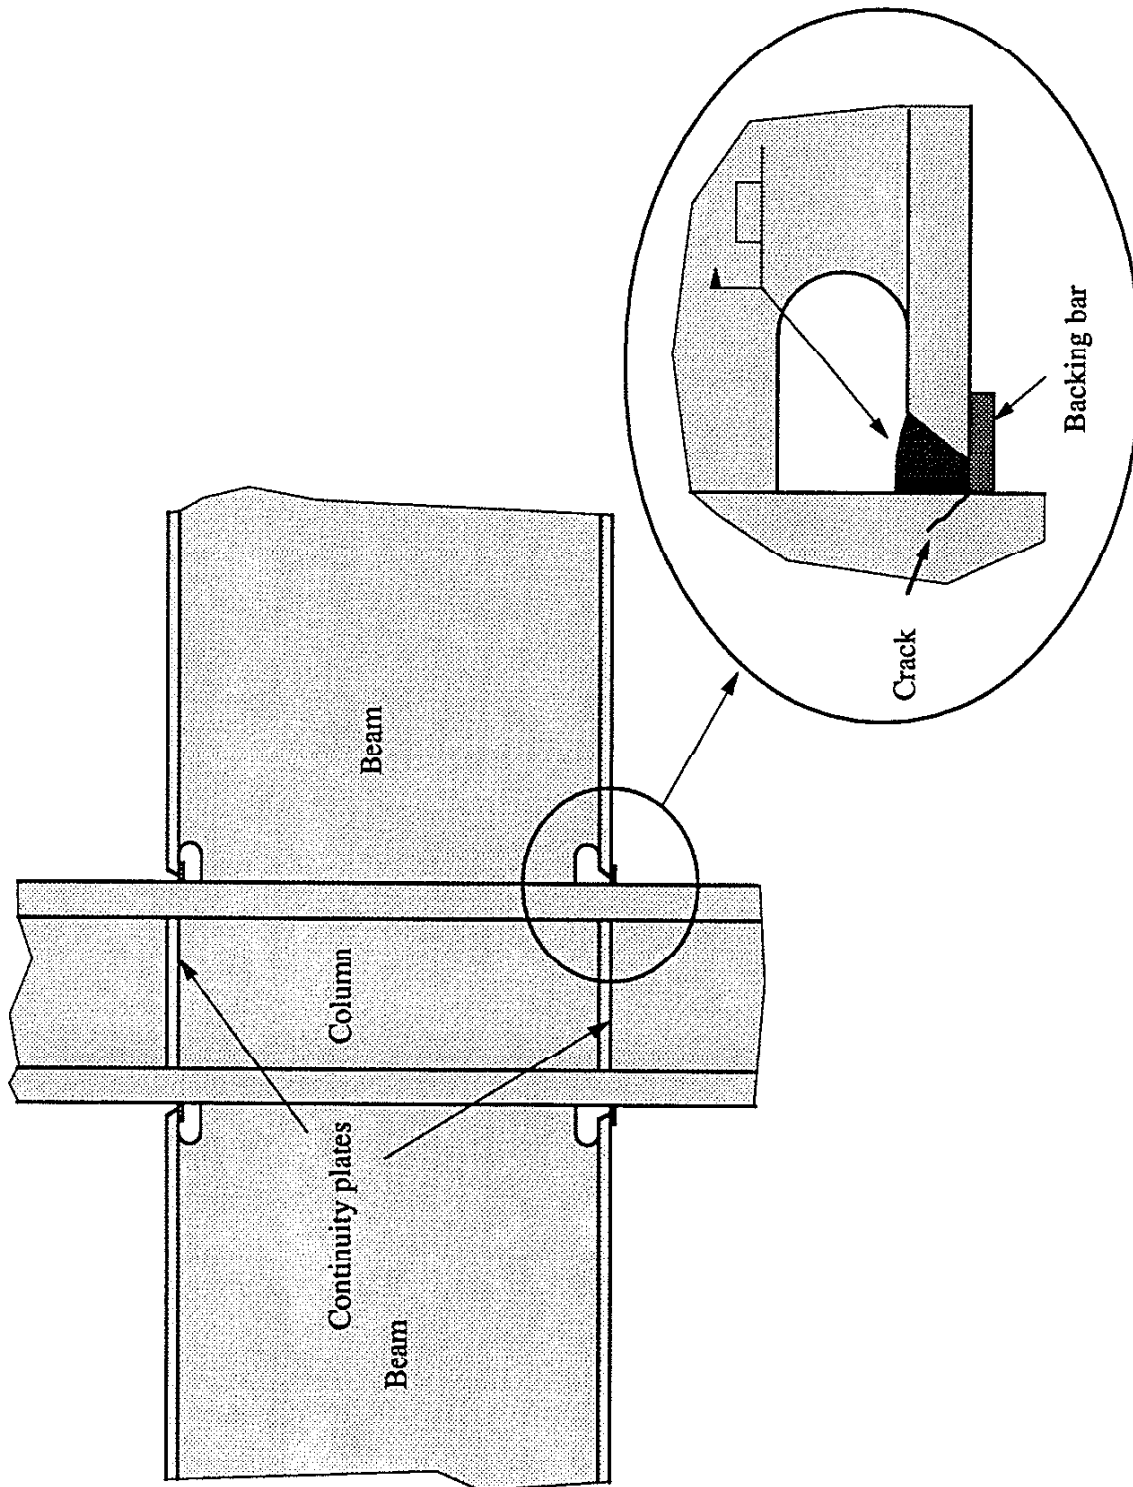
A typical pre-Northridge beam-to-column connection. The crack starts from the backing bar.
